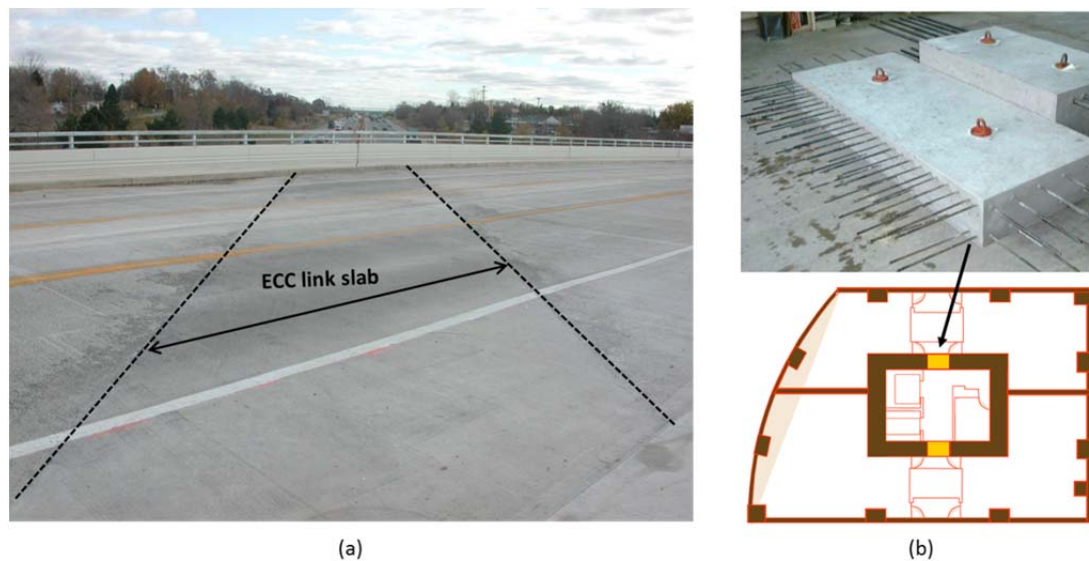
Application of reinforced ECC in structural elements: (a) a continuous steel reinforced ECC slab in Michigan in 2005 (Lepech 2009); (b) steel reinforced ECC dampers in high-rise concrete buildings in Japan in 2004 and 2005 (Kunieda & Rokugo 2006)
